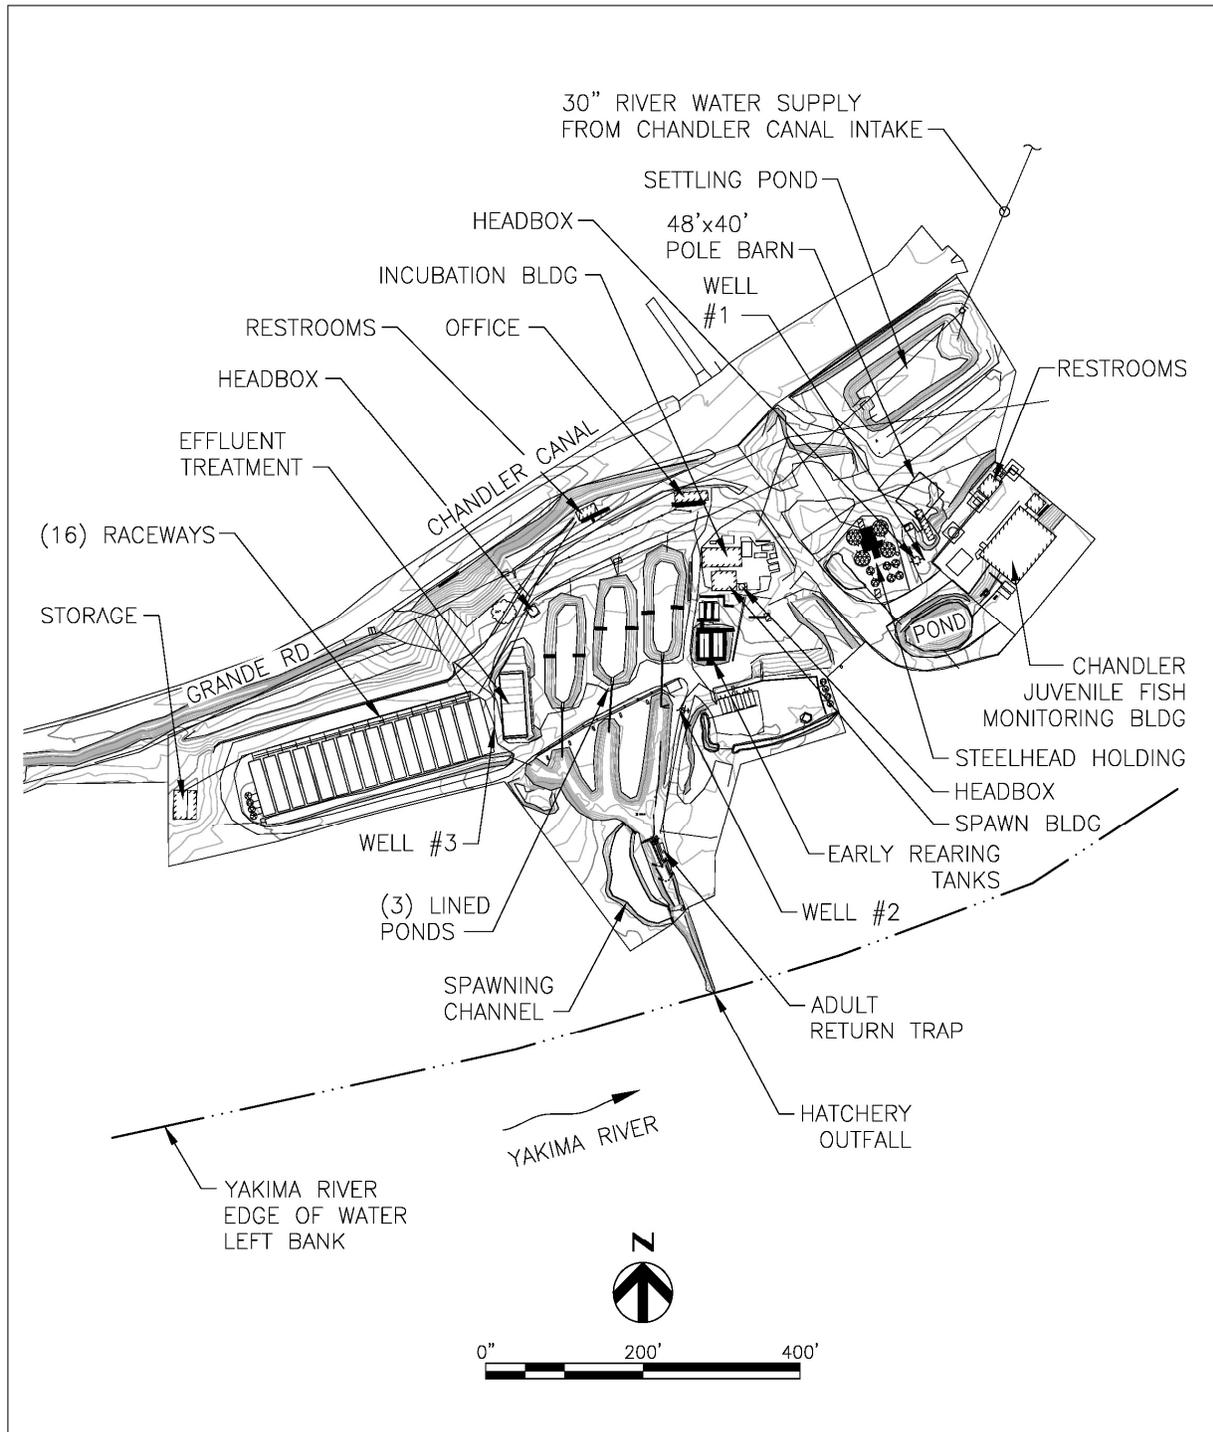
Plan view of existing facilities at Prosser Hatchery
